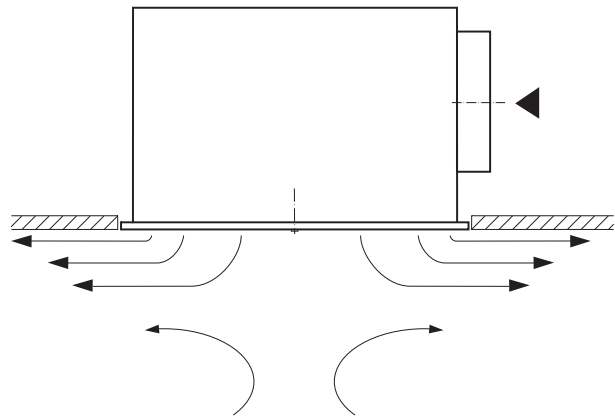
Jet pattern with air outlet installed flush with ceiling
